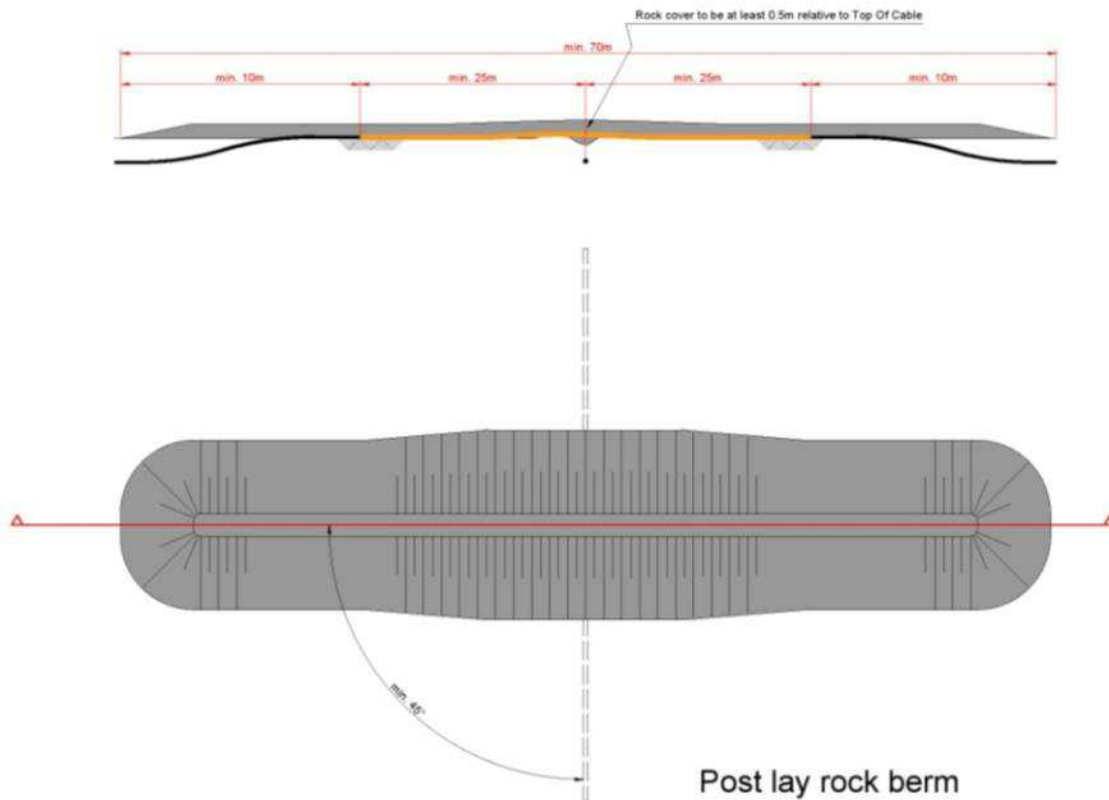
Typical lowering 3rd party asset - rock crossing structure
